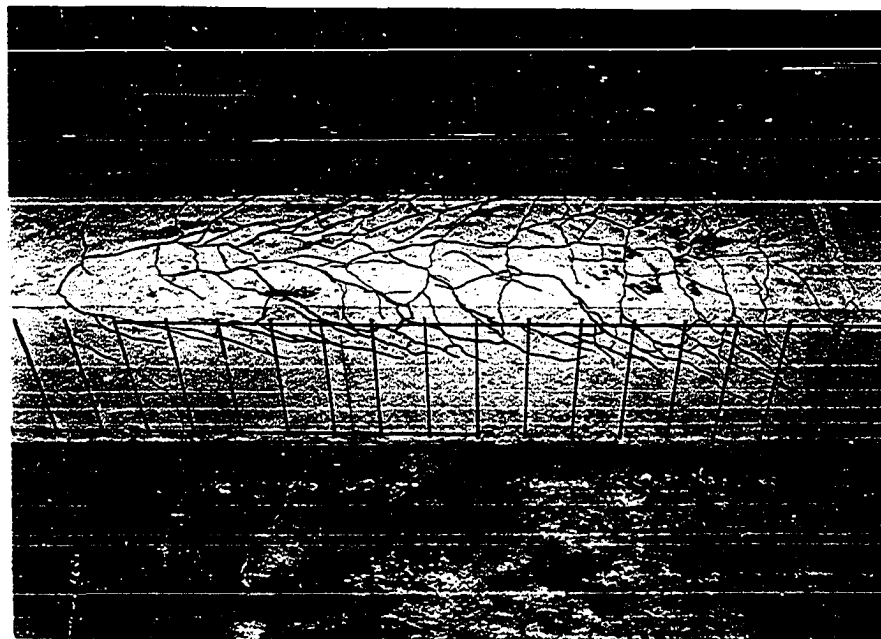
Transverse cracking and longitudinal splitting at failure (Specimen 5C76V)
